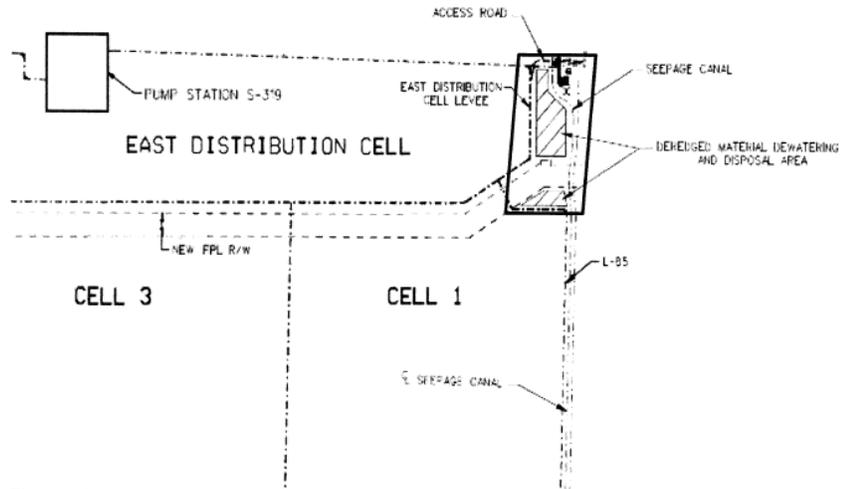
L-40 Borrow Canal Proposed Modifications (dredged disposal area only; see *Figure 3* for dredging, widening, excavated material disposal area, and berm construction) at vicinity of east of the East Distribution Cell in STA-1E.
